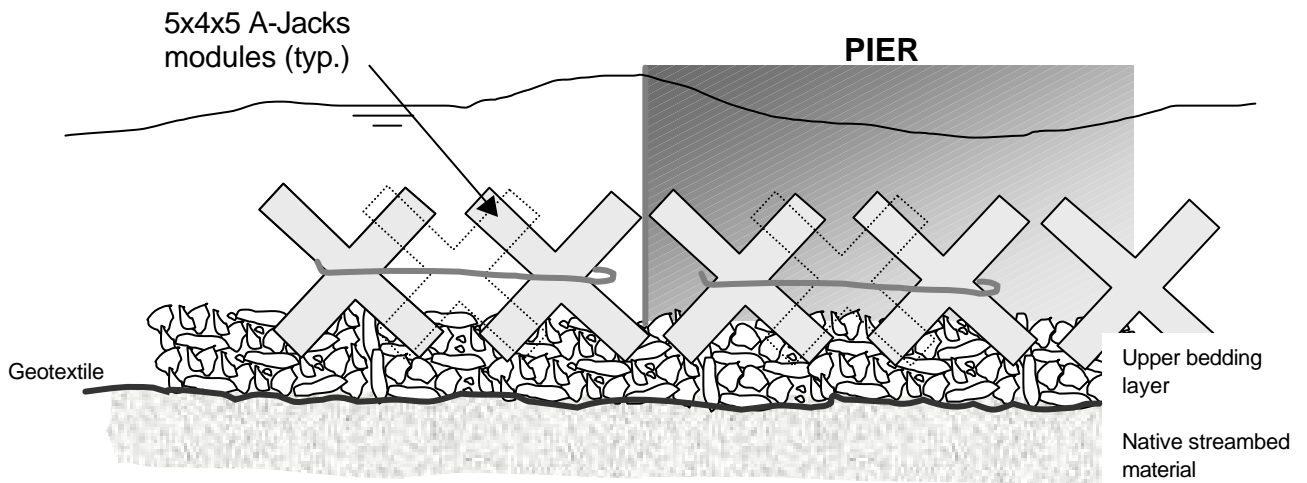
Bedding detail showing ballast stone on top of geotextile.
